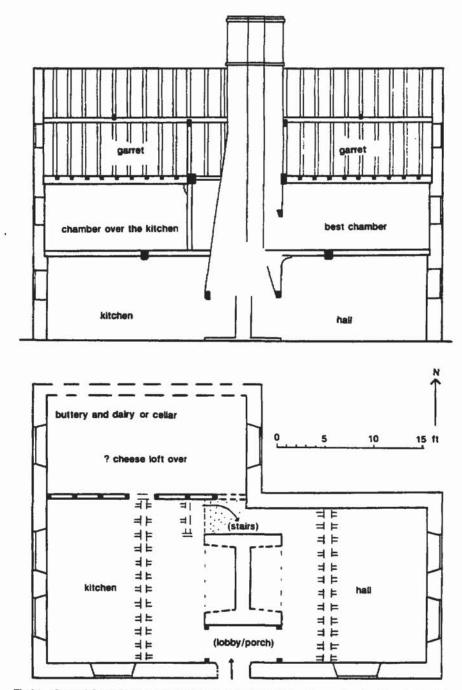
Ground-floor plan (below) and long section of Uphill farmhouse, showing the original stairs as they were until about 1975. Later additions have been omitted. It is assumed that the cellar of the farmer's inventory (Appendix C) is the dairy of the building accounts. (See the discussion of this point in the text.)
